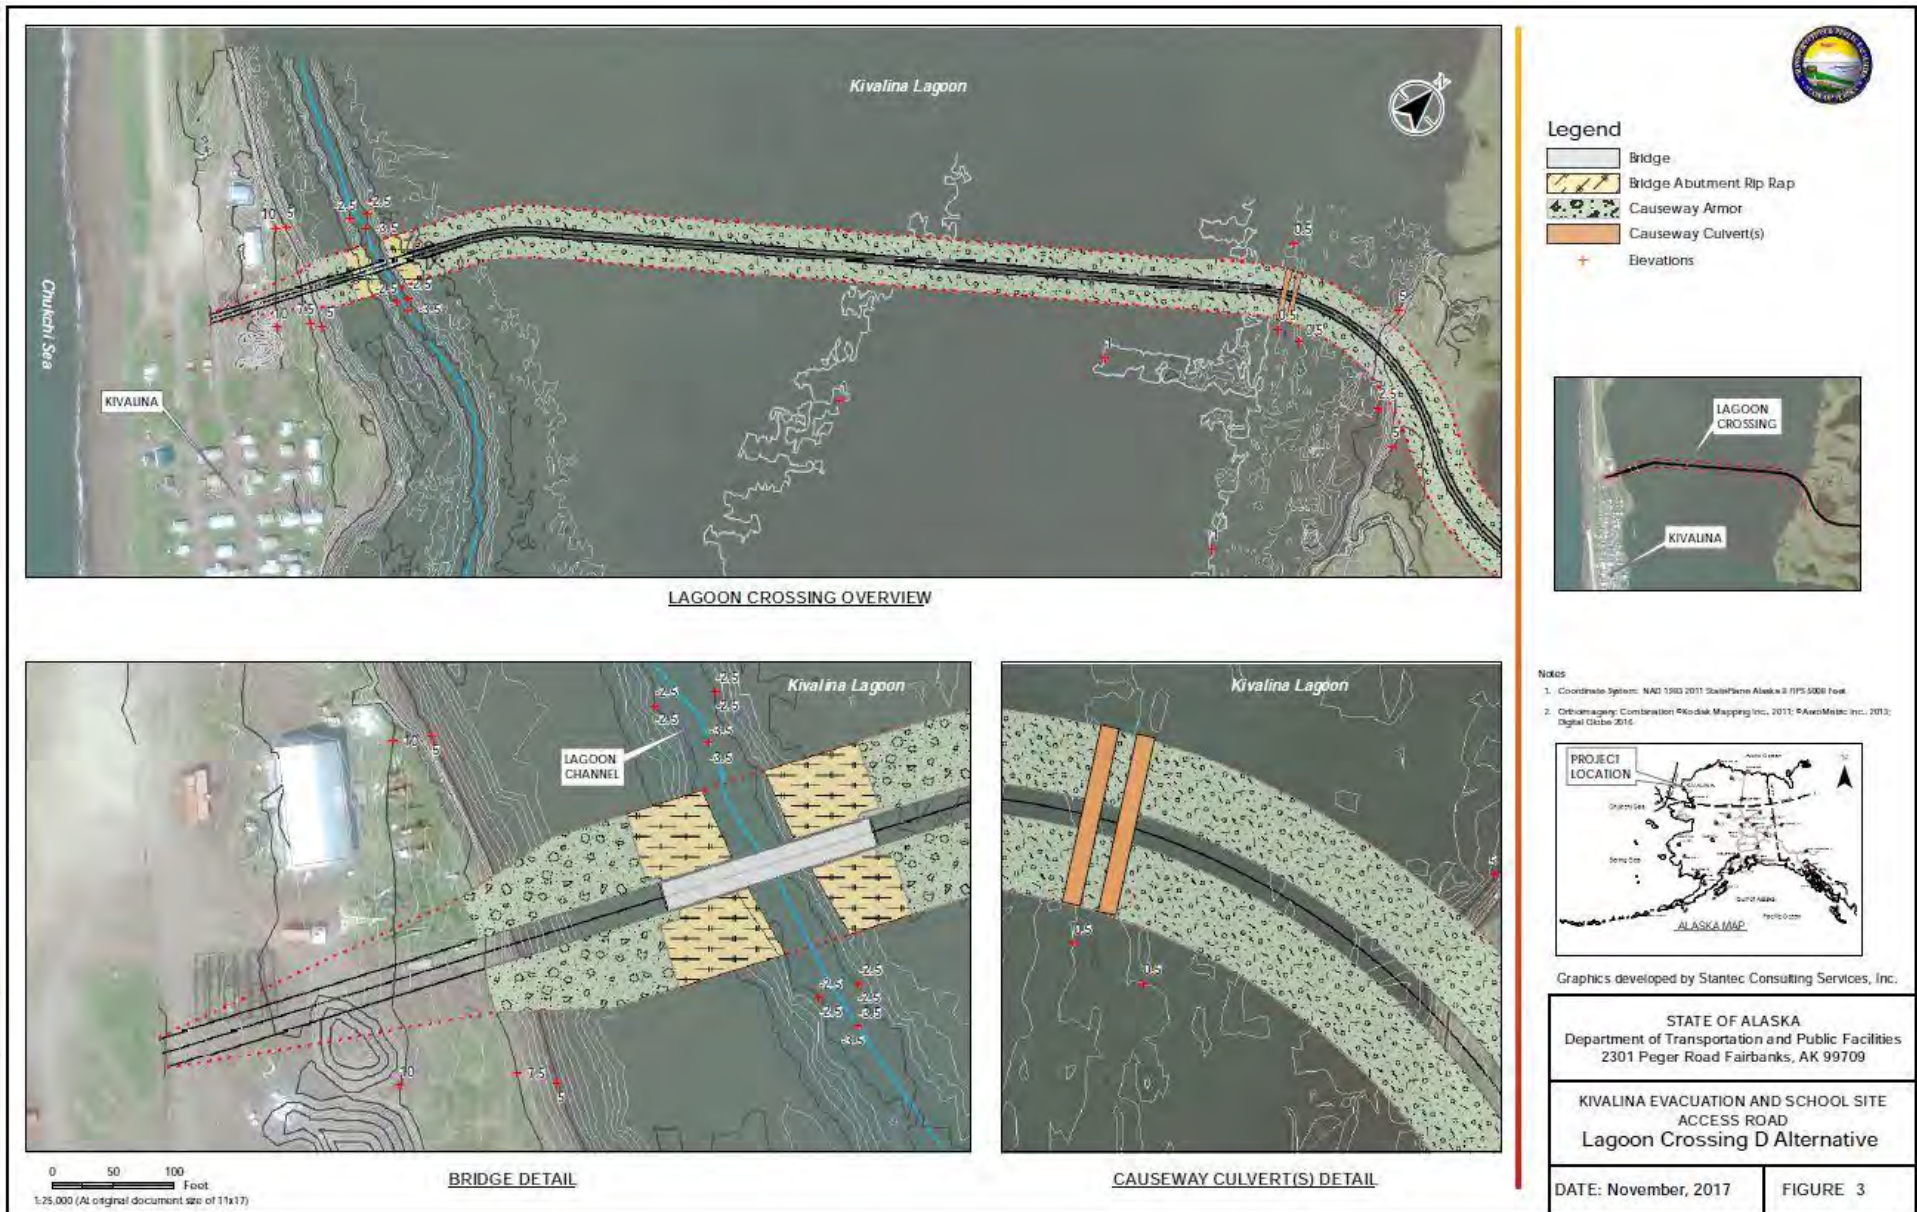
Detail of the proposed 0.98-km Kivalina Lagoon Causeway, including the lagoon channel bridge (bottom left) and northeastern culvert configuration (bottom right).
